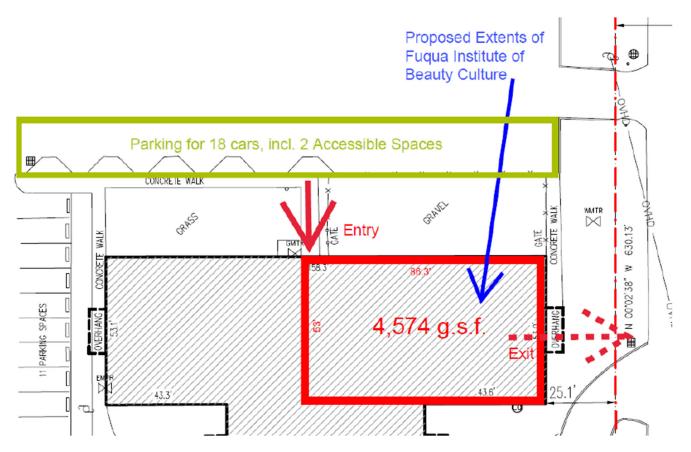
Zoomed in site plan for vocational school inside 5640 E 38th Street.
